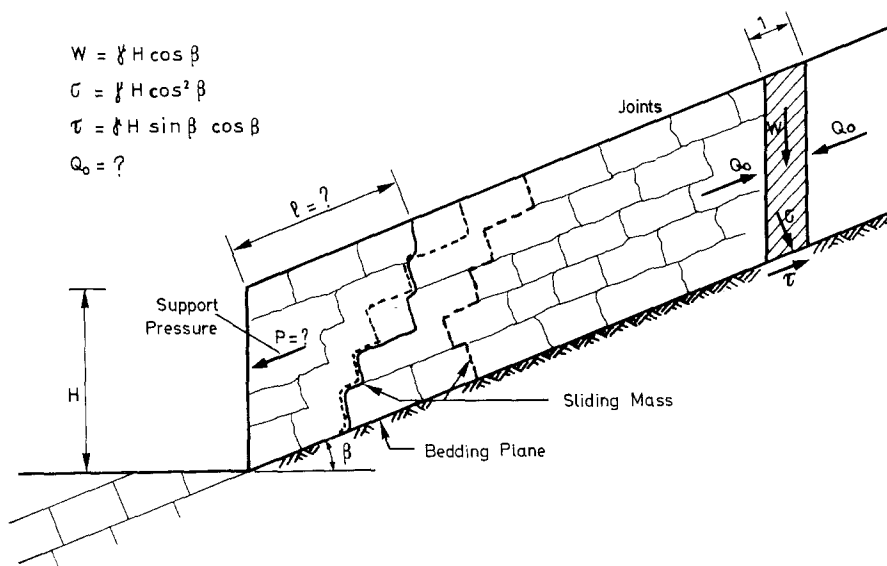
A stratified and jointed rock mass dipping parallel to the slope surface, initial equilibrium and possible shapes of the sliding mass after excavation
